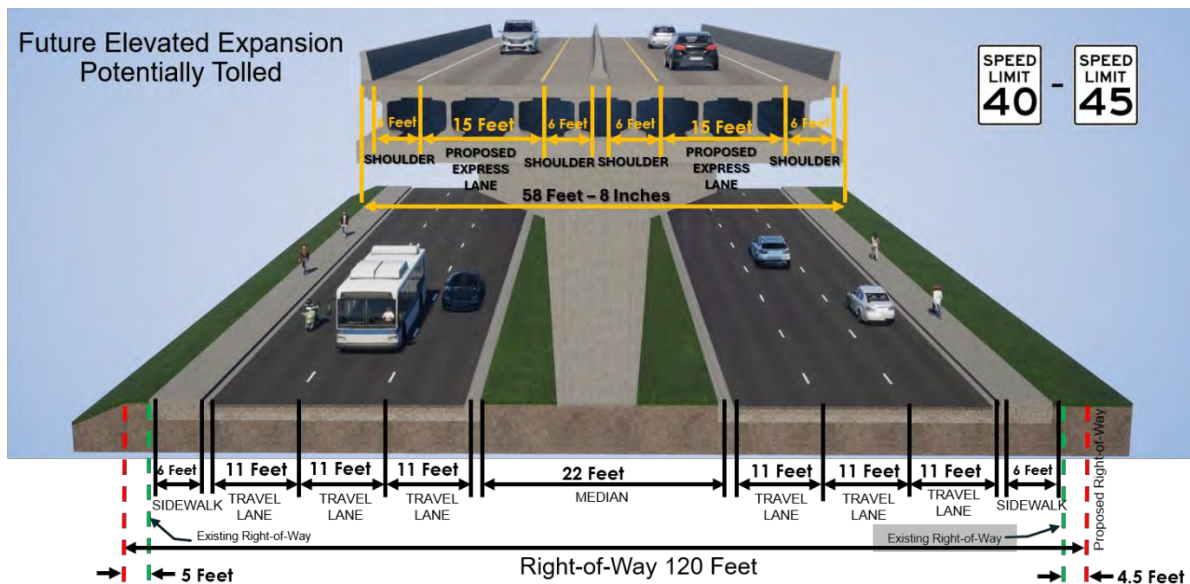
Preferred Roadway Typical Section: South of DeSoto Bridge
